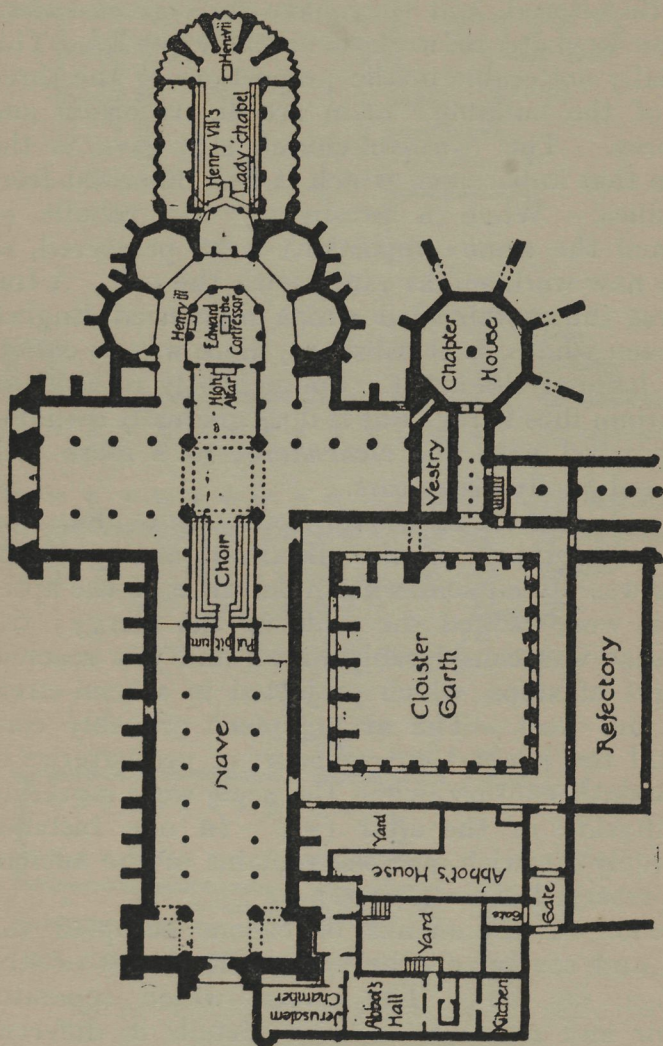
THE FRENCH PLAN. WESTMINSTER ABBEY
